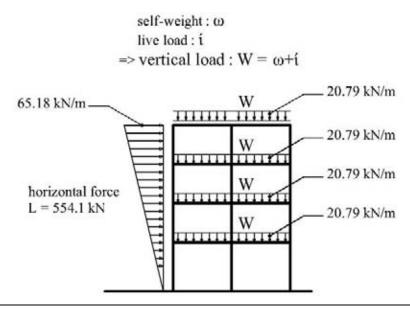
loading scheme of one single frame in wooden tube model
